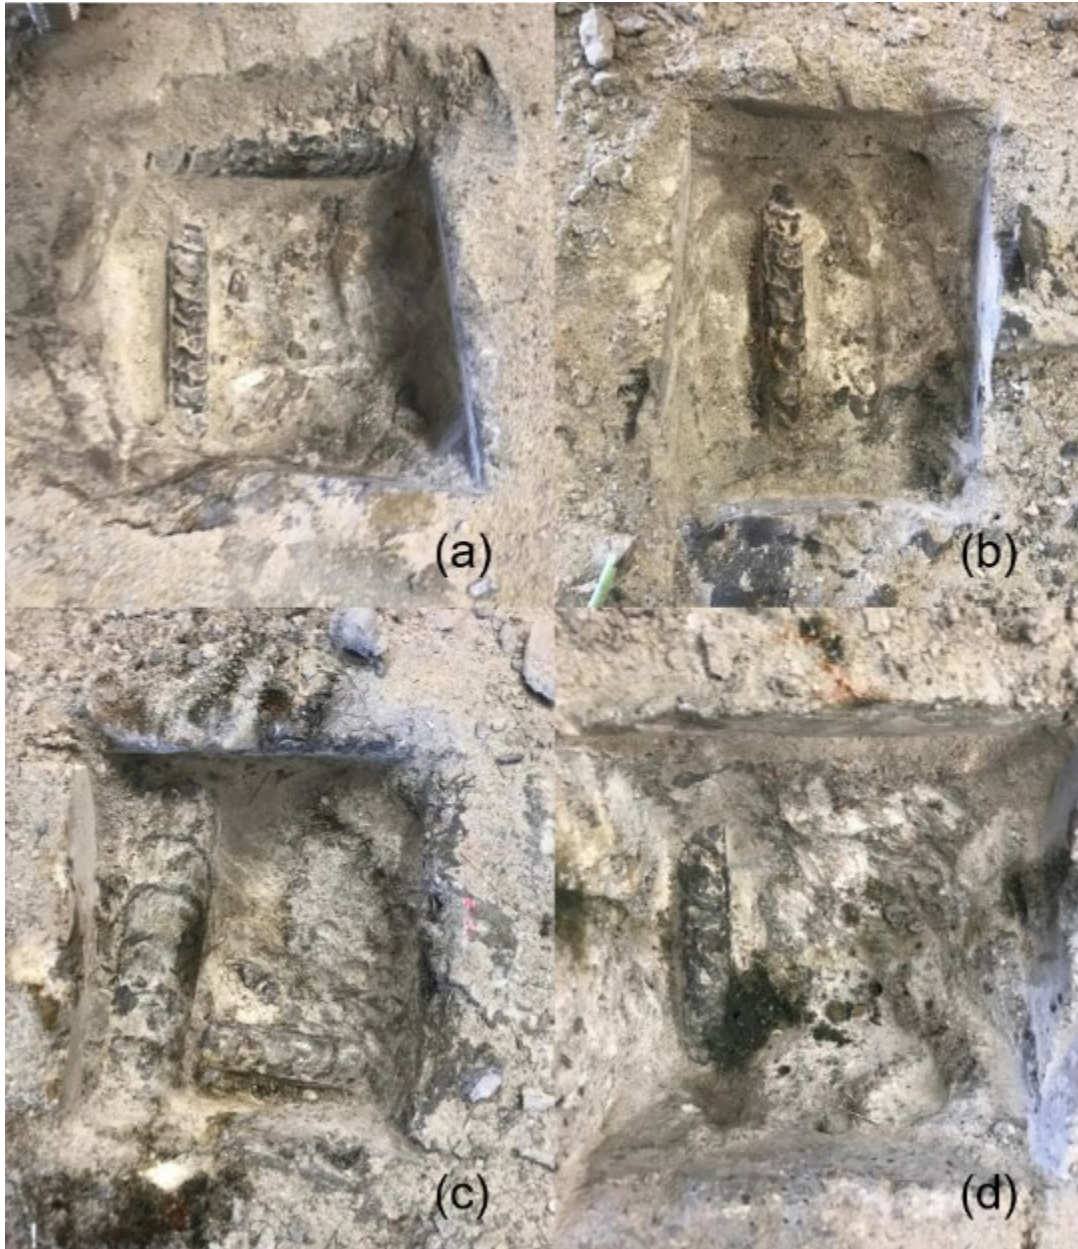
Fifth rebar excavation for large-scale corrosion specimens using (a) ODOT AA, (b) J3, (c) Ductal®, and (d) Phoscrete
